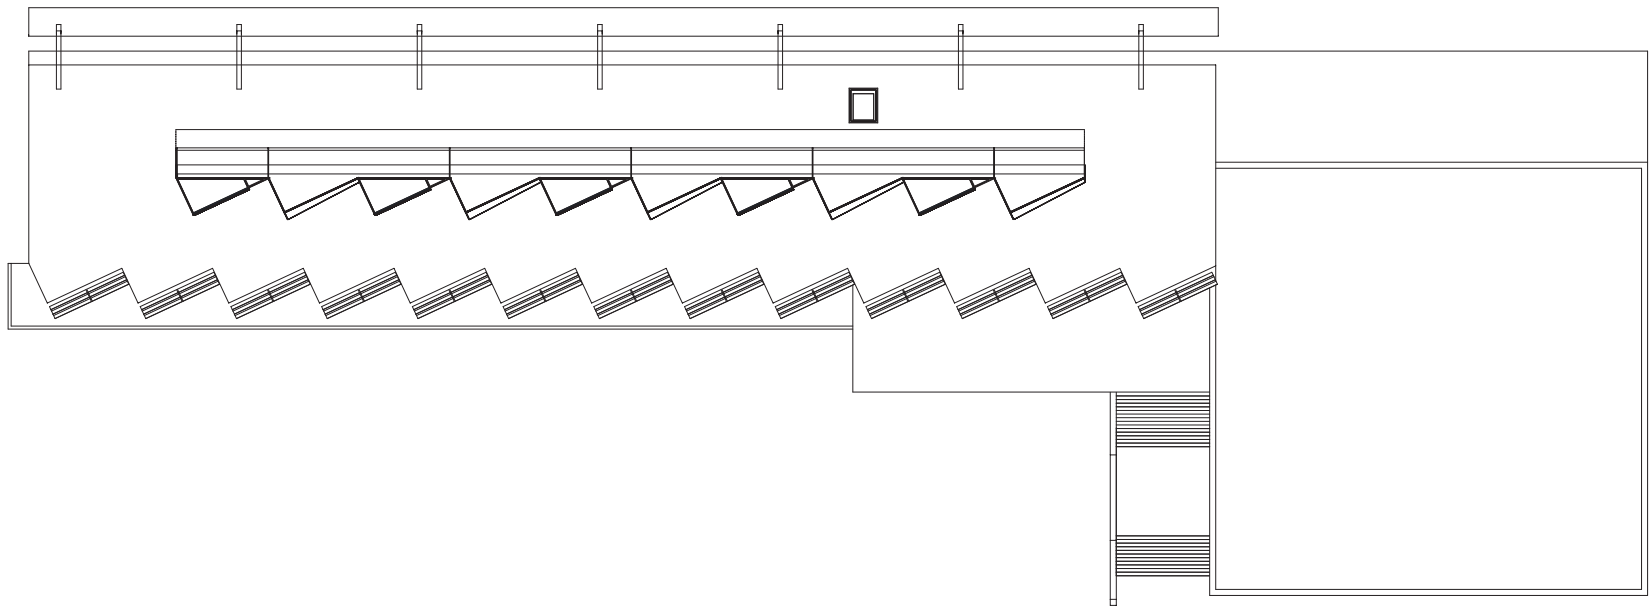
Roof plan of the New Generation Office Building (Scale 1:500)
